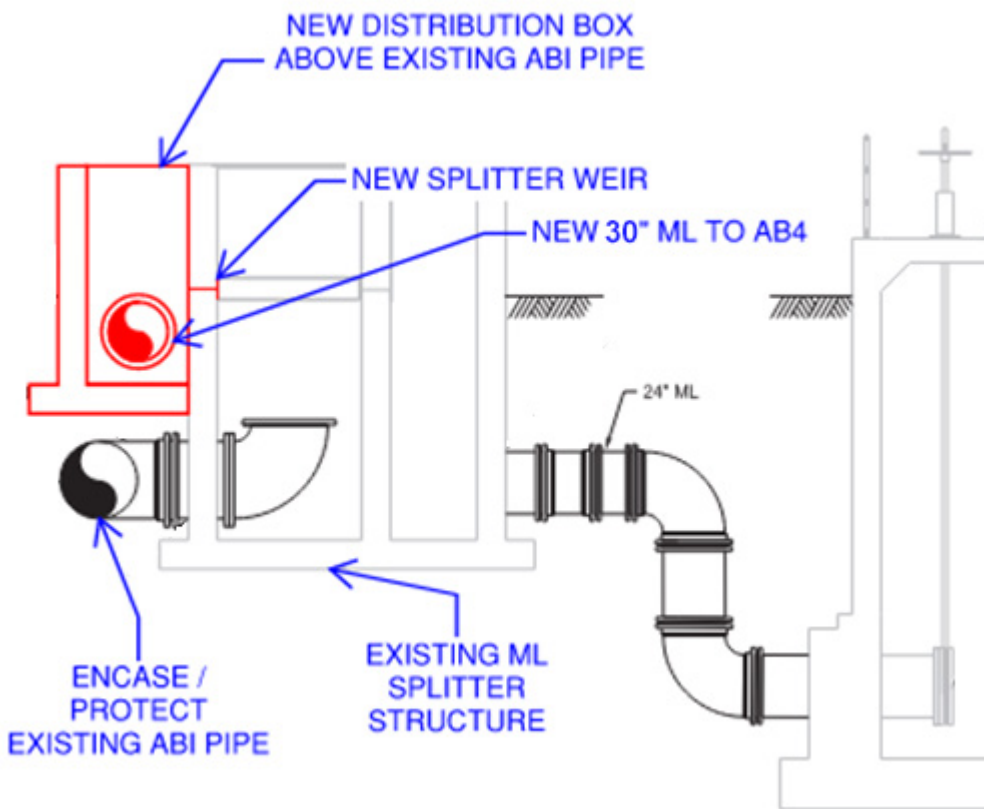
Proposed Mixed Liquor Splitter Box Modification (Section)
